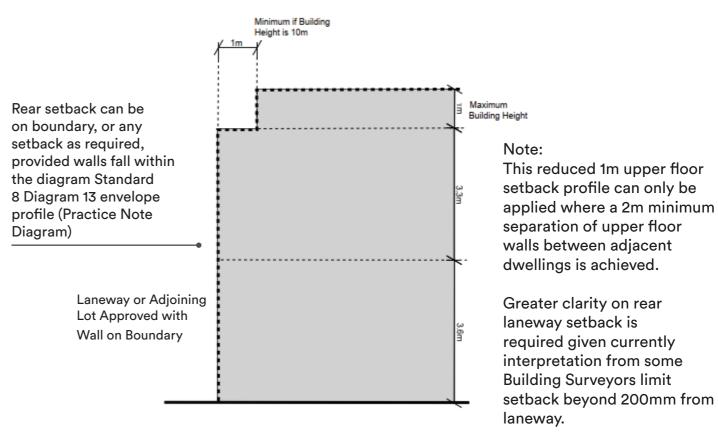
Revised Diagram 12 - Standard 8 Side and Rear Setback Profile - Where a laneway or adjoining lot is approved on boundary Type A and B
